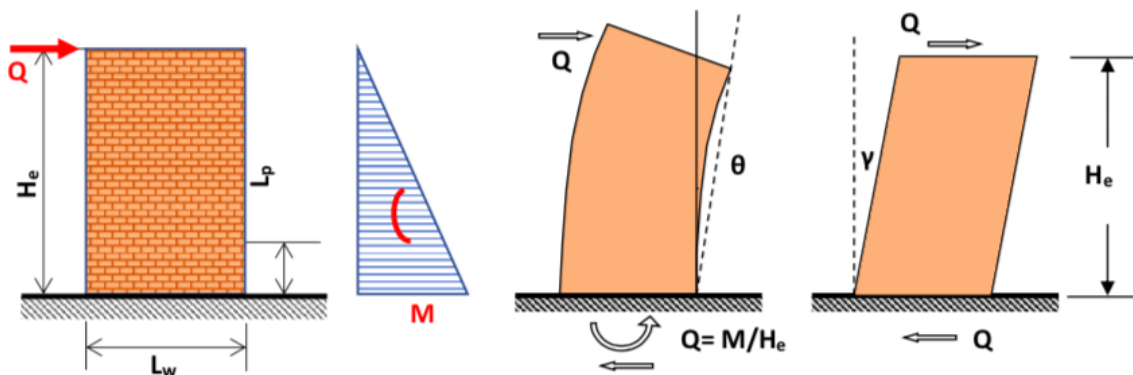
Cantilever model, moment diagram and drift ratio contributions from flexural curvature (θ) and shear distortion (γ) of a typical reinforced masonry wall specimen tested under a case 1 type actuator arrangement (Adapted from Pantazopoulou 2023)
